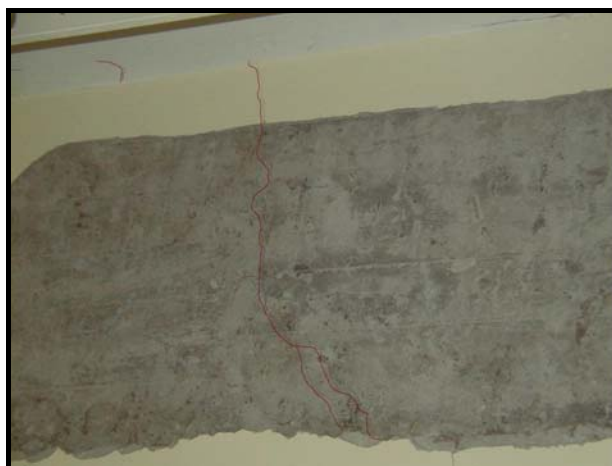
Flexural crack in the ground floor beam B24 (Bolu)
